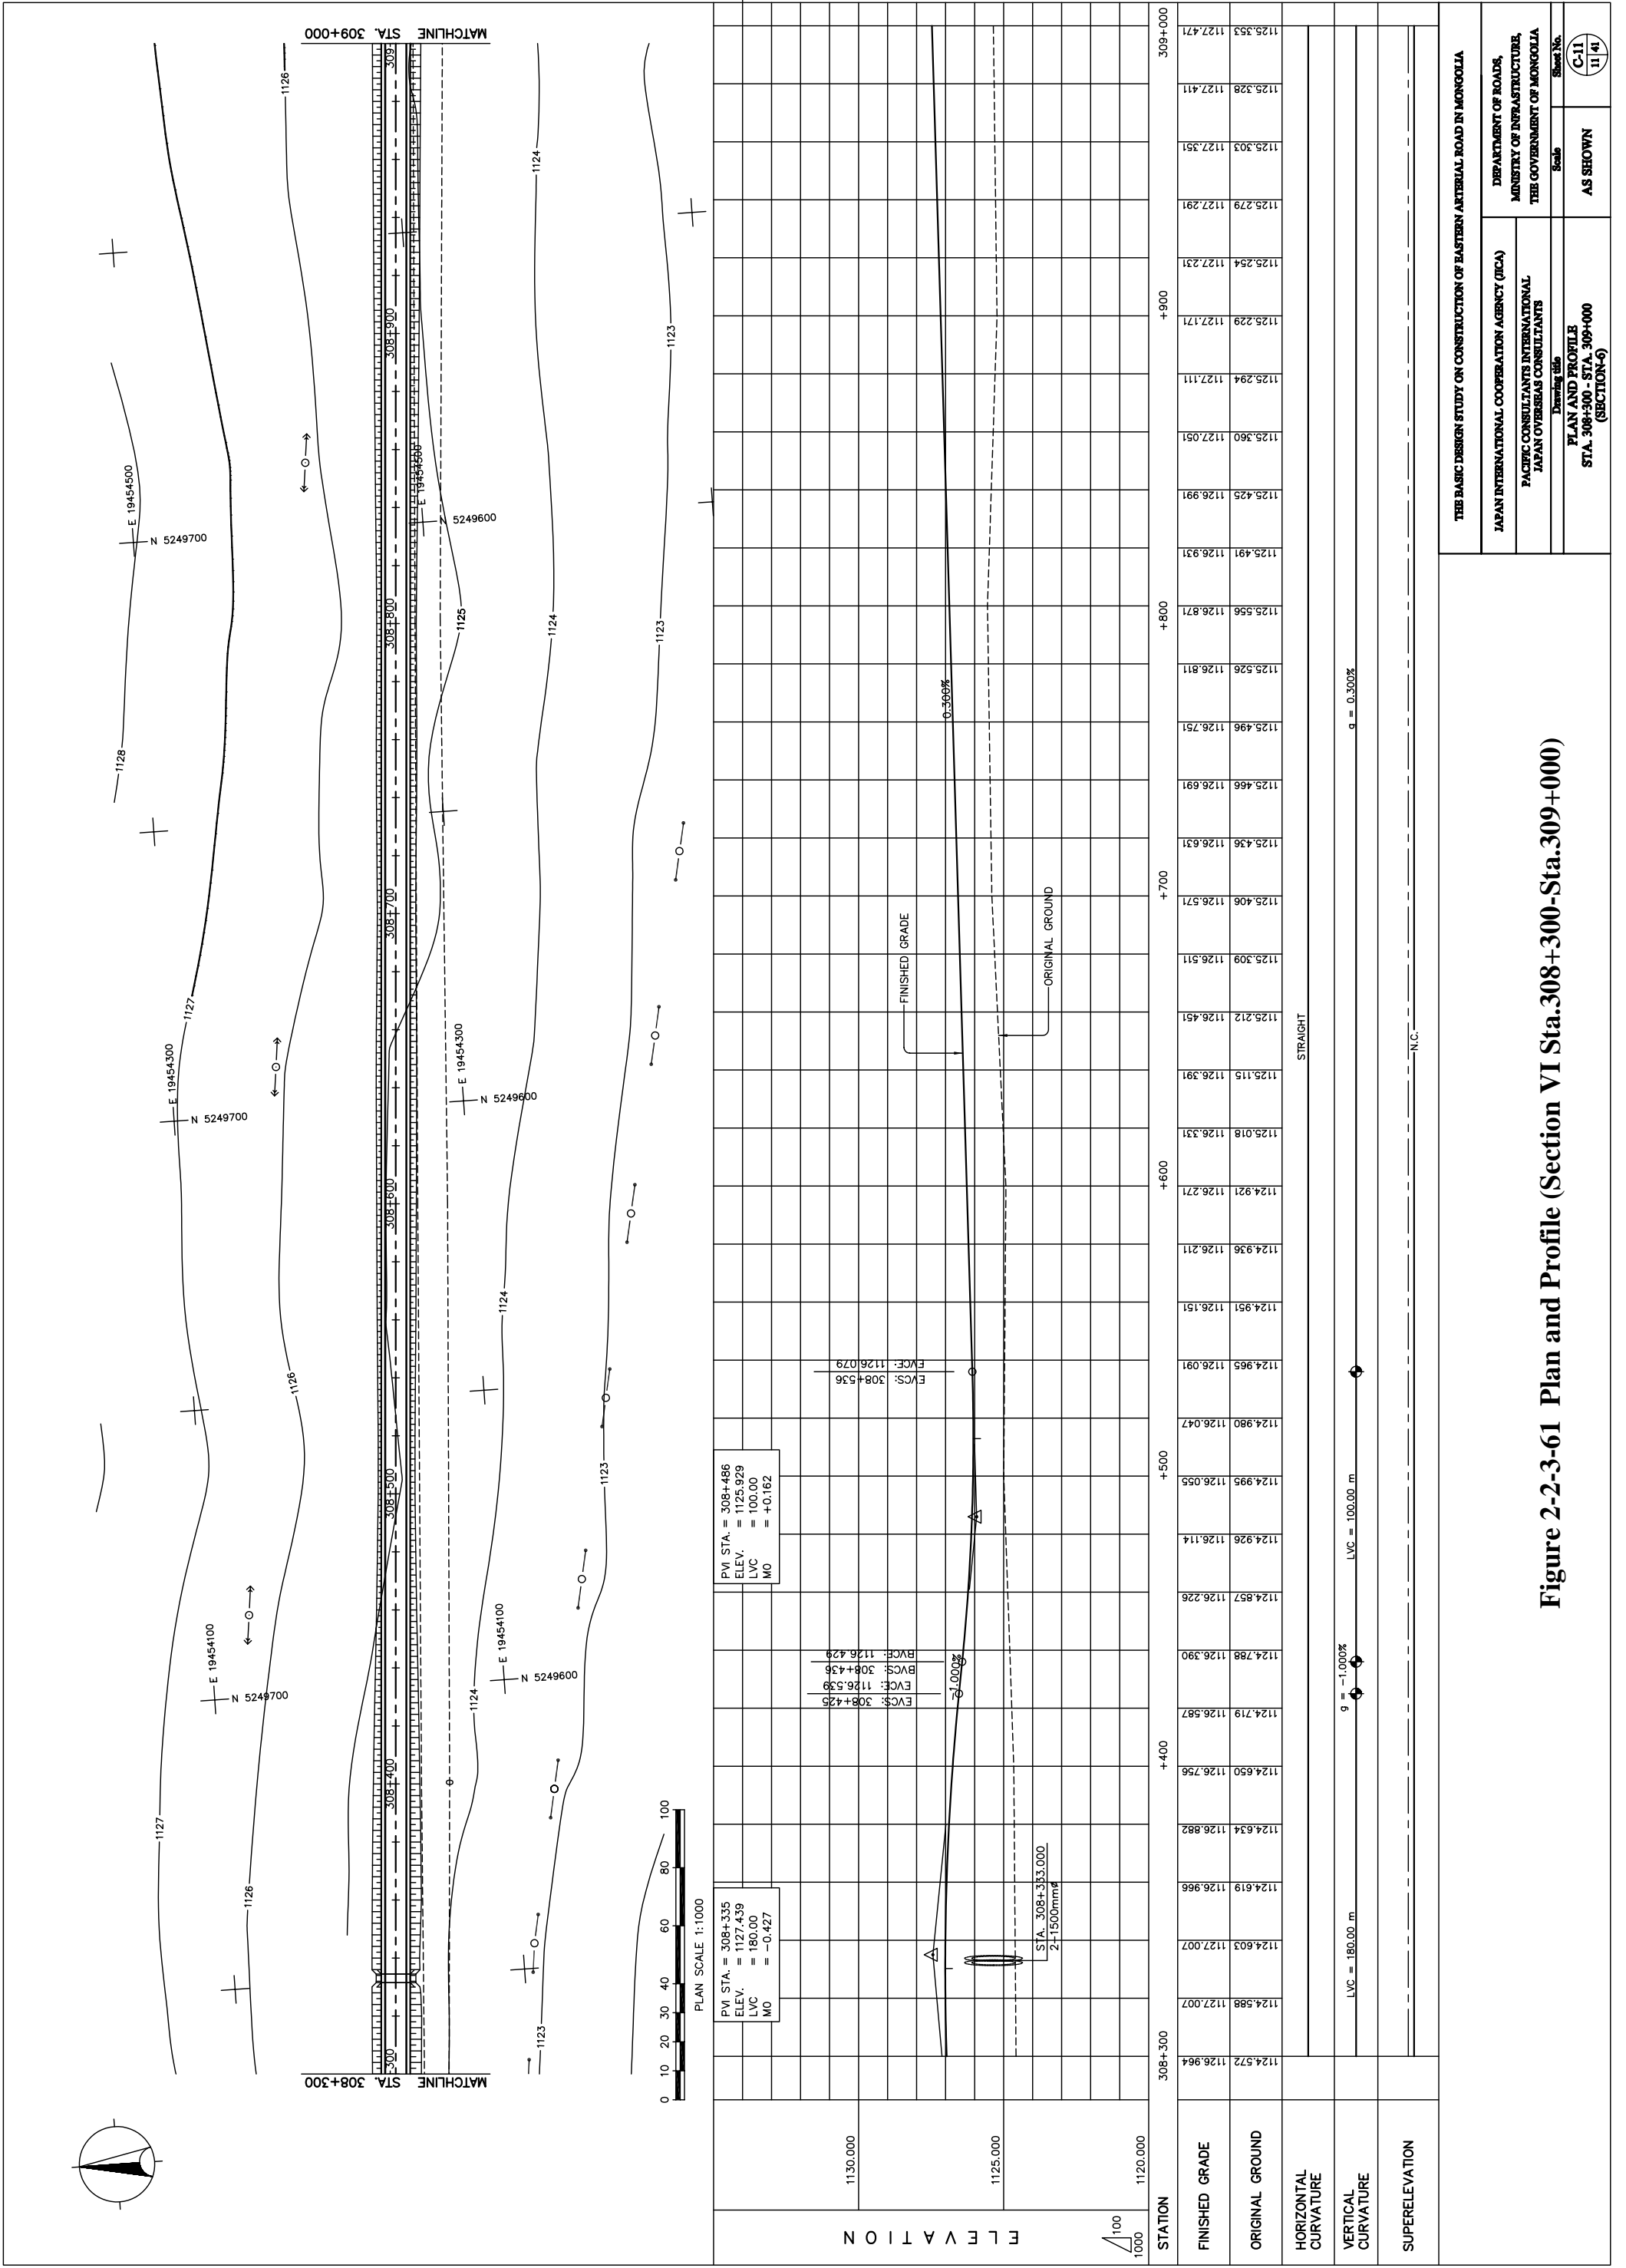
Plan and Profile (Section VI Sta.308+300-Sta.309+000)
